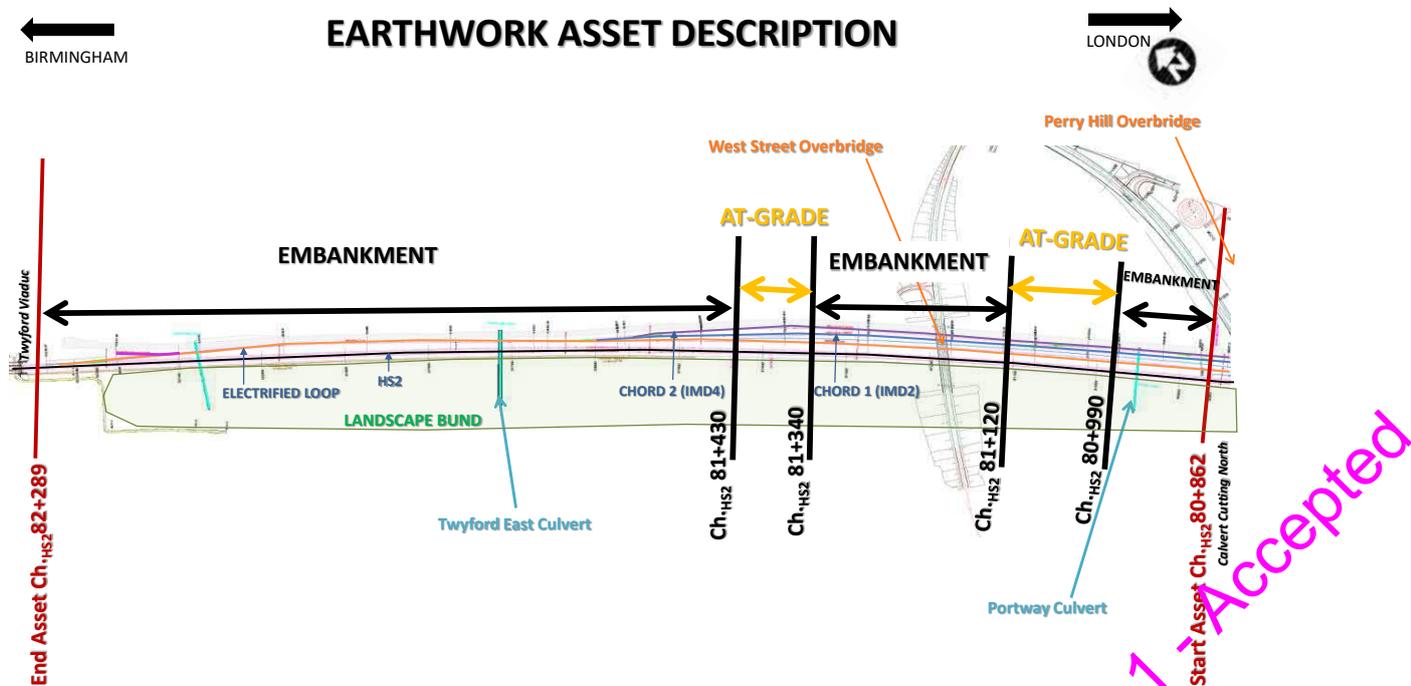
Schematic plan showing sections of embankment and at grade – Twyford Embankment (indicated only)
